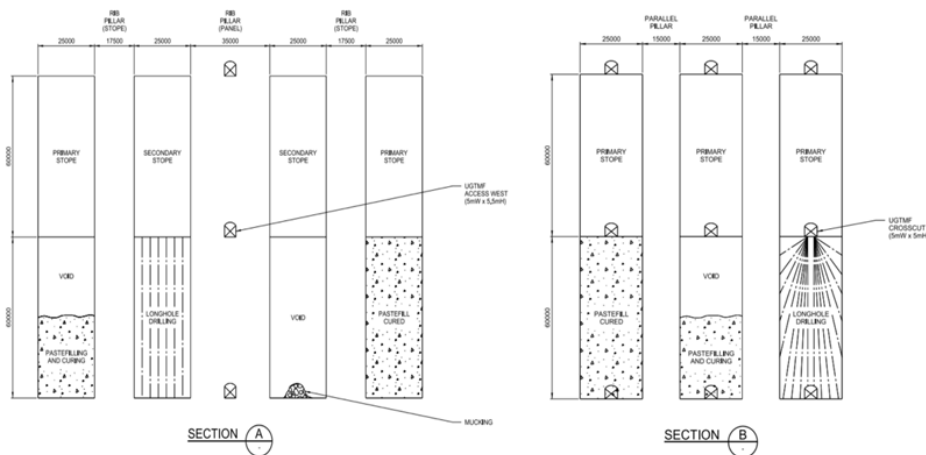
Cross-sections of the UGTMF (source: NexGen -Rook I Project Mining Geotechnical Assessment)
